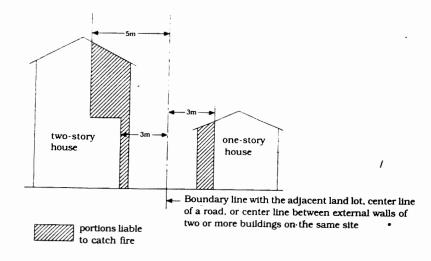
Portion Liable to Catch Fire (Building Center of Japan, 1995)
